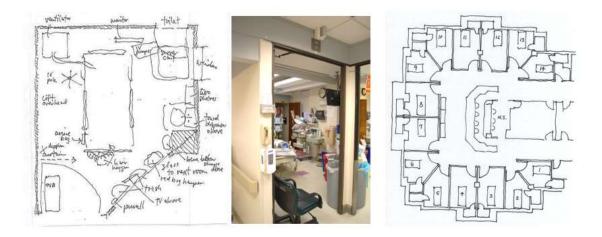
Units WG & WH sketch plans and photo; a very small, crowded room
